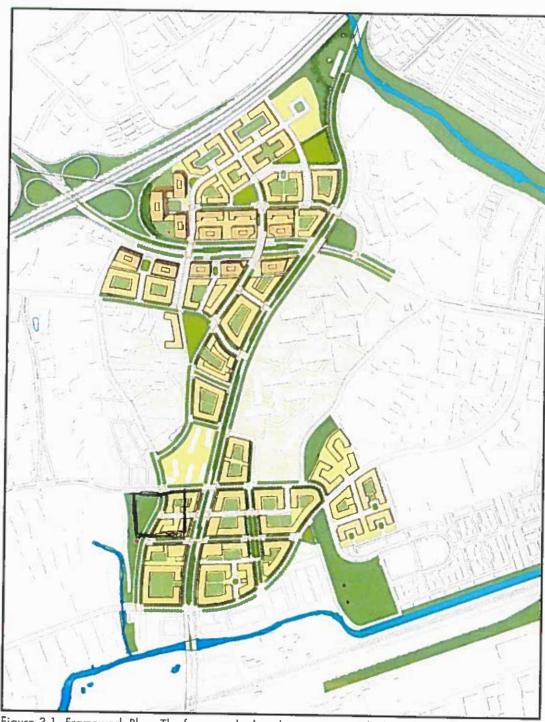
Framework Plan. The framework plan shows conceptually how the areas proposed for redevelopment in the plan could be developed to achieve the vision outlined. New streets, parks and new mixed-use developments are shown.
